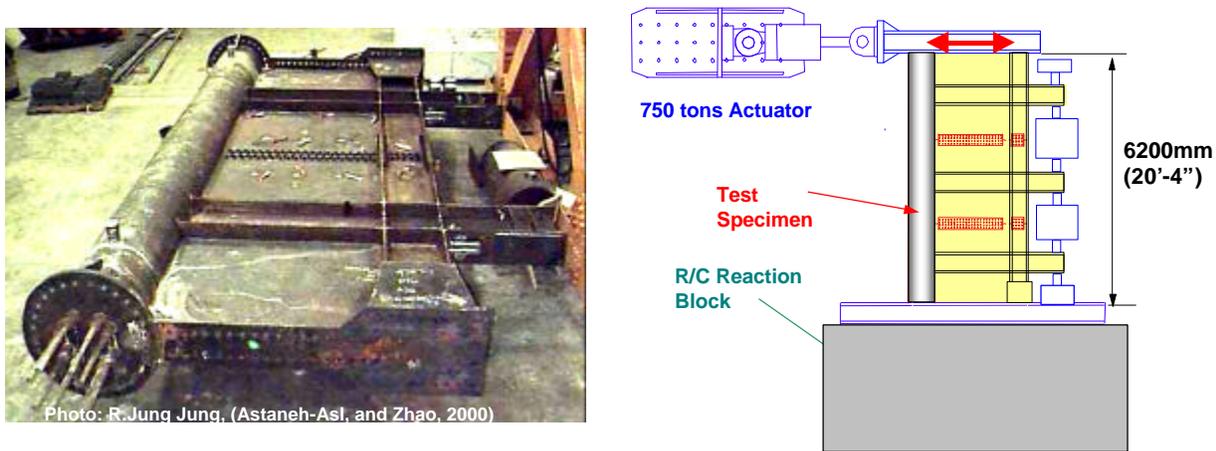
Typical specimen and test set-up (Astaneh-Asl and Zhao, 2000).
